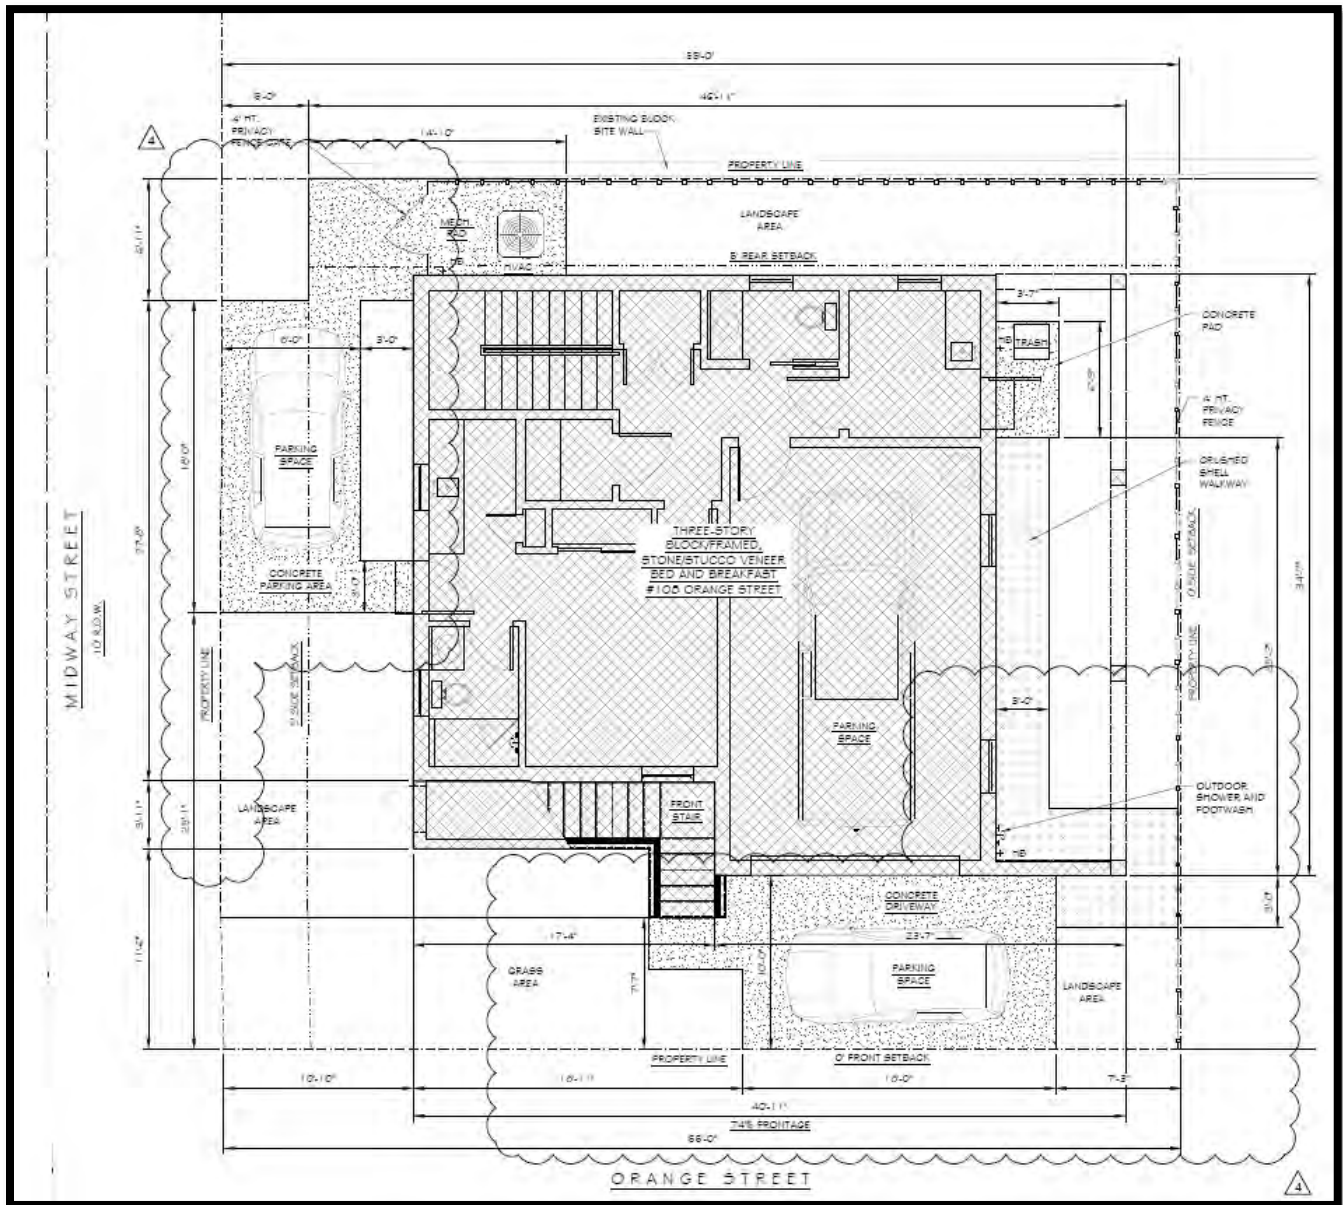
Proposed Site Plan 108 Orange St, Neptune Beach, FL
